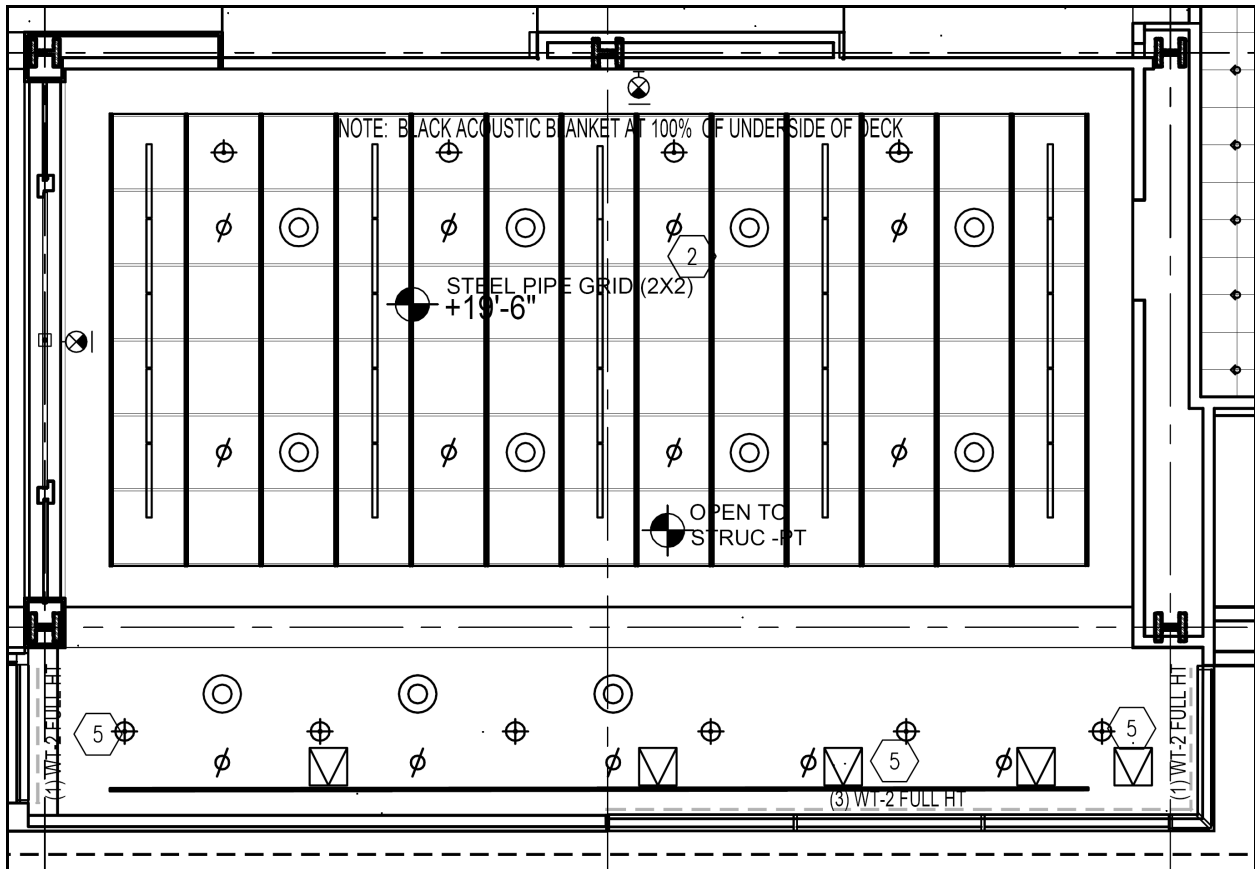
| Multi Purpose Room Reflected Ceiling Plan – Existing Design [Not to Scale]
